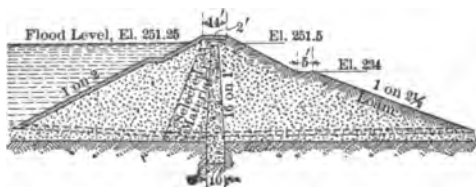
Core-wall and Earth Embankment, Boston Water-works.
